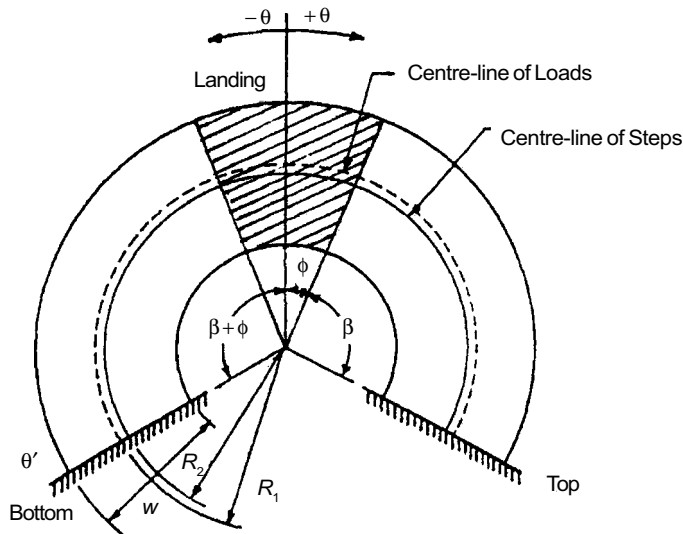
Plan of a helicoidal stair slab with intermediate landing
